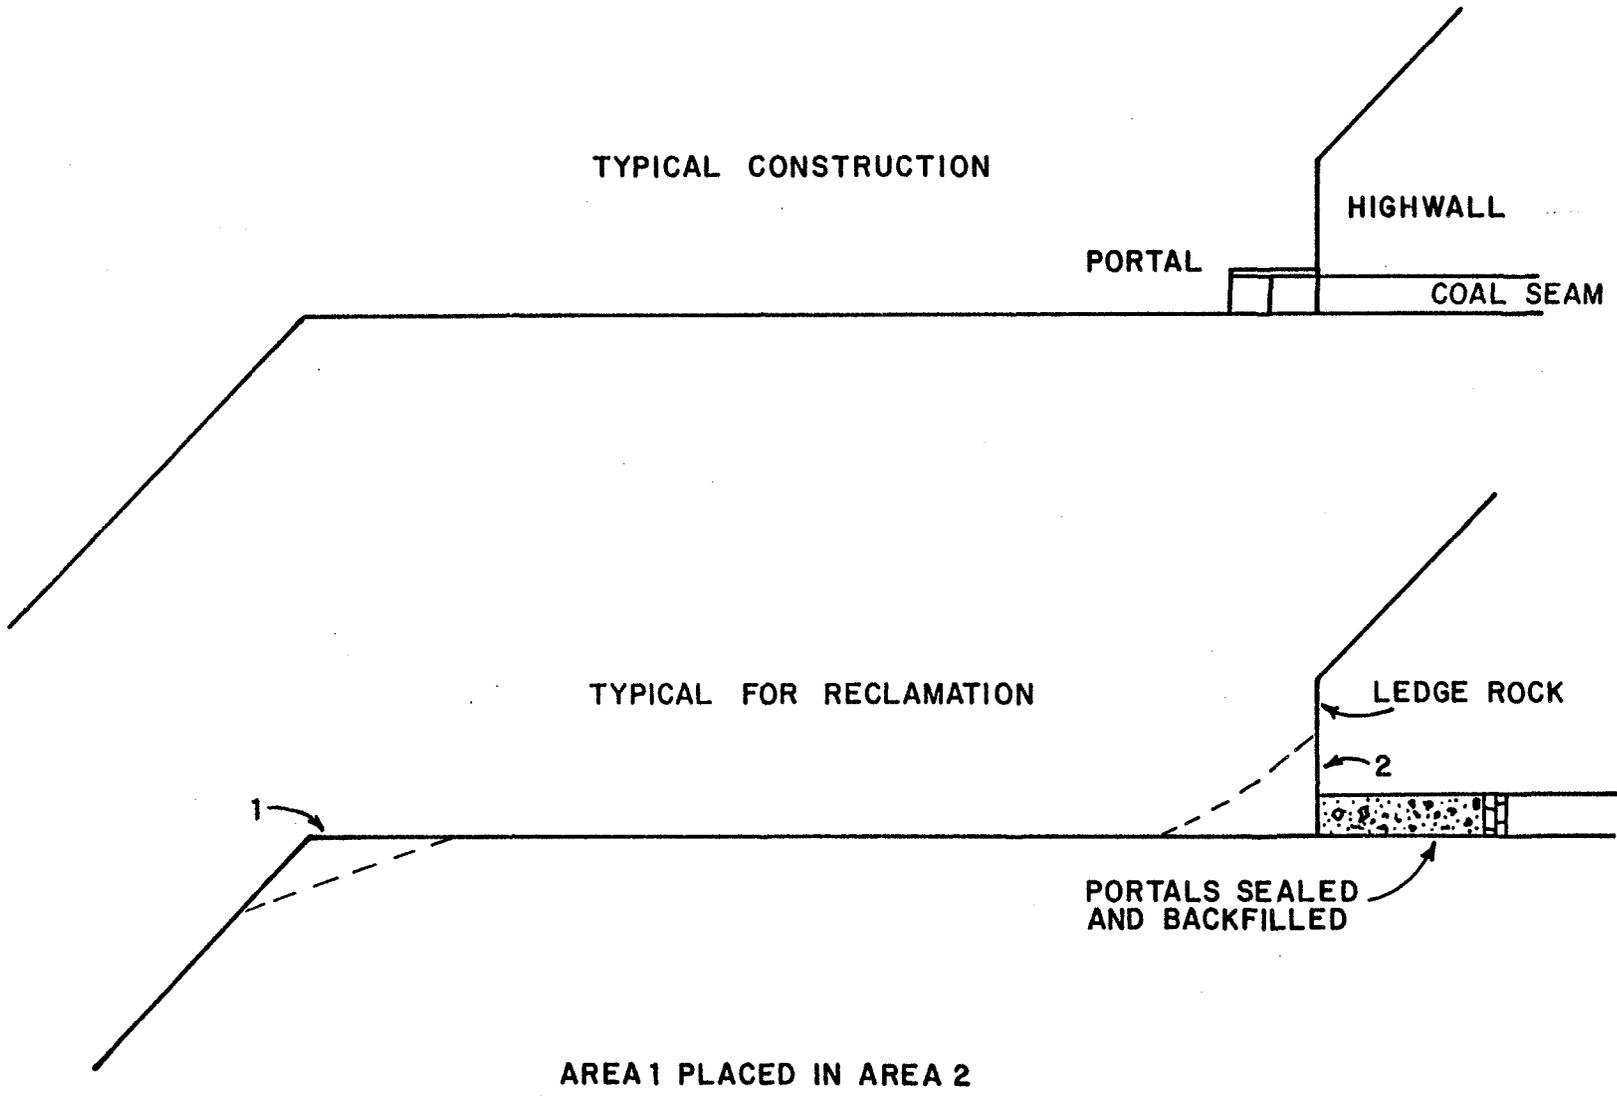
TYPICAL YARD AND PORTAL REGRADING
